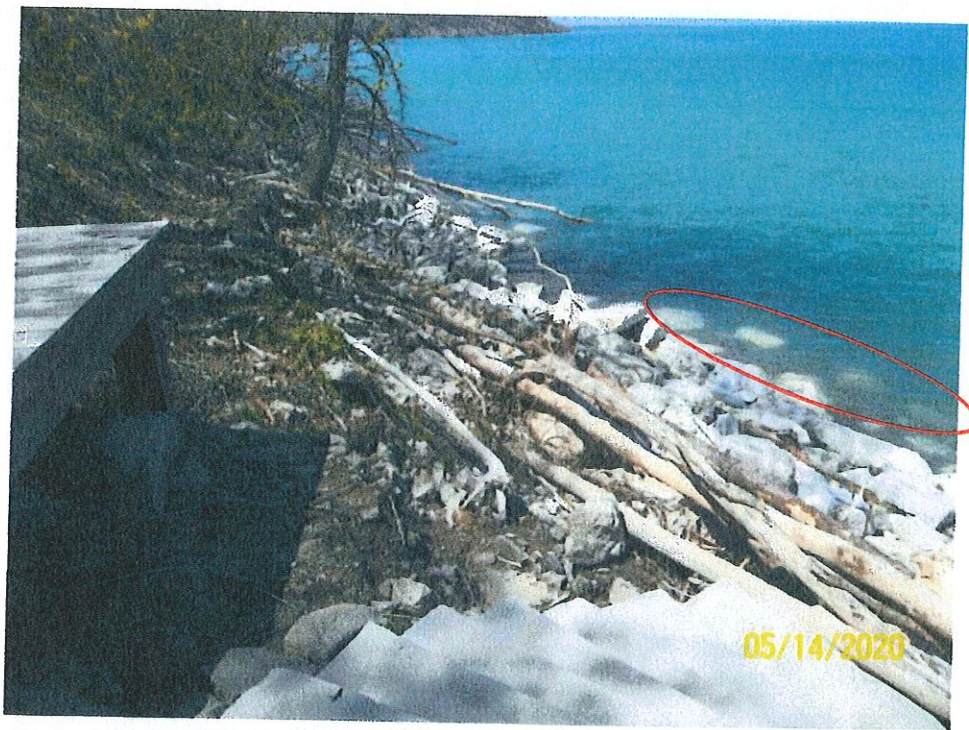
LOOKING NORTH ALONG THE SUBJECT SHORELINE AT THE EXISTING CONCRETE RUBBLE AND RIP RAP REVETMENT. THE STONES CIRCLED IN RED SHOULD BE SALVAGED AND MOVED WESTWARD.
